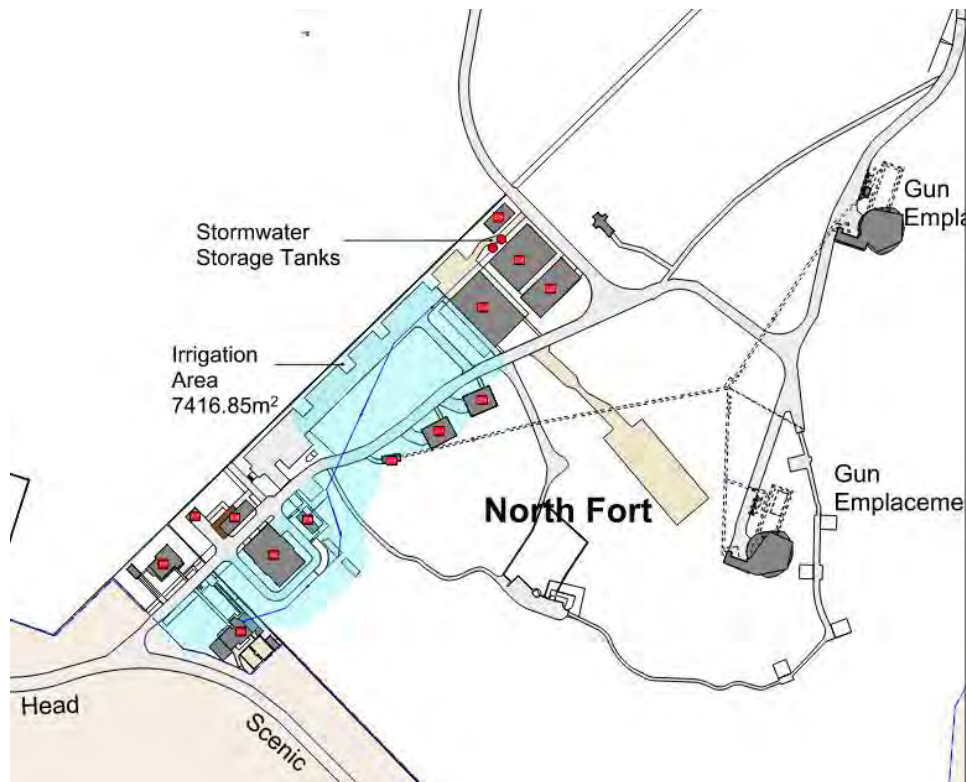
Plan of existing drainage infrastructure in the south of the site – NH.00-Services-Master-Plan-Draft-20210510
